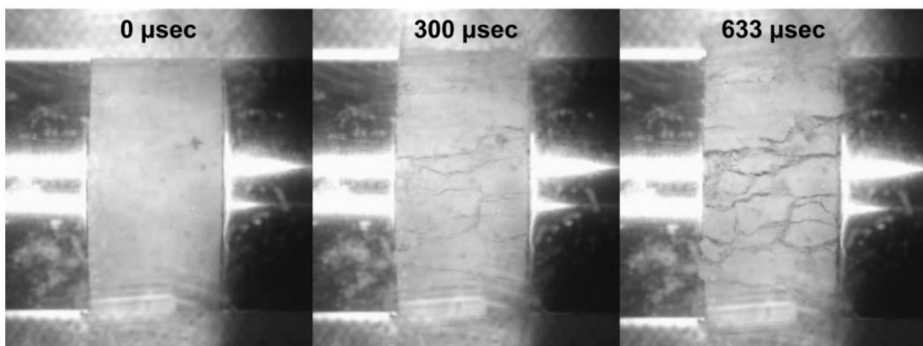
Fracture pattern of S52-D75-L38 test 3
